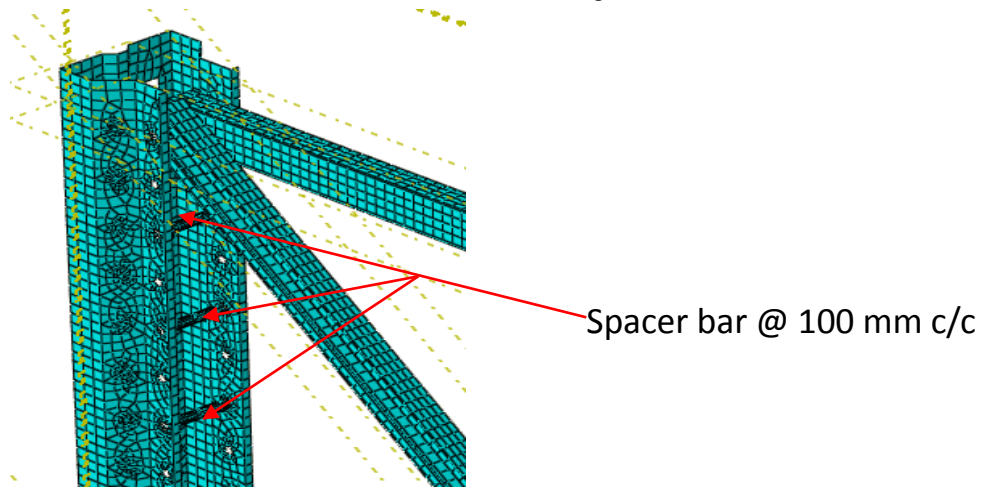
Typical meshing of column section and details of joint of frame with spacer bar @ 100 mm c/c
